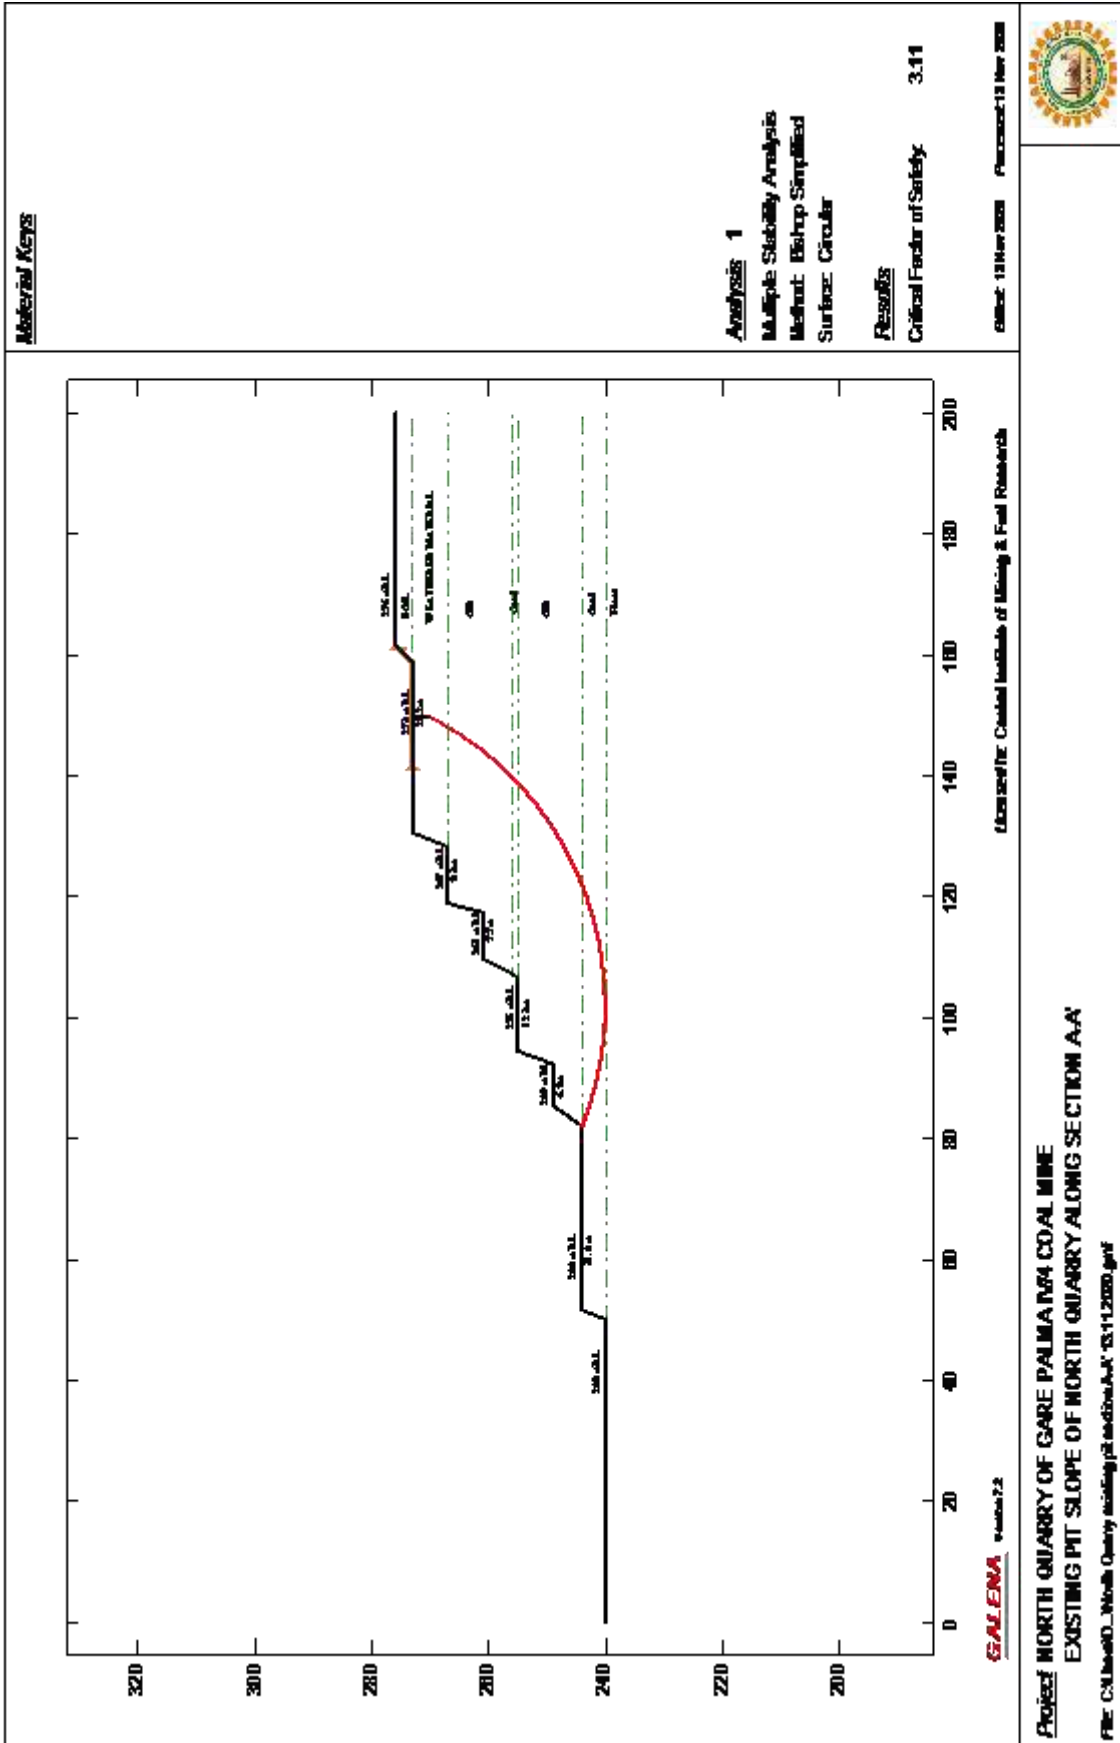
Slope stability analysis of existing pit of North Quarry (Patch-C) along section A-A' between 240 mRL to 276 mRL
